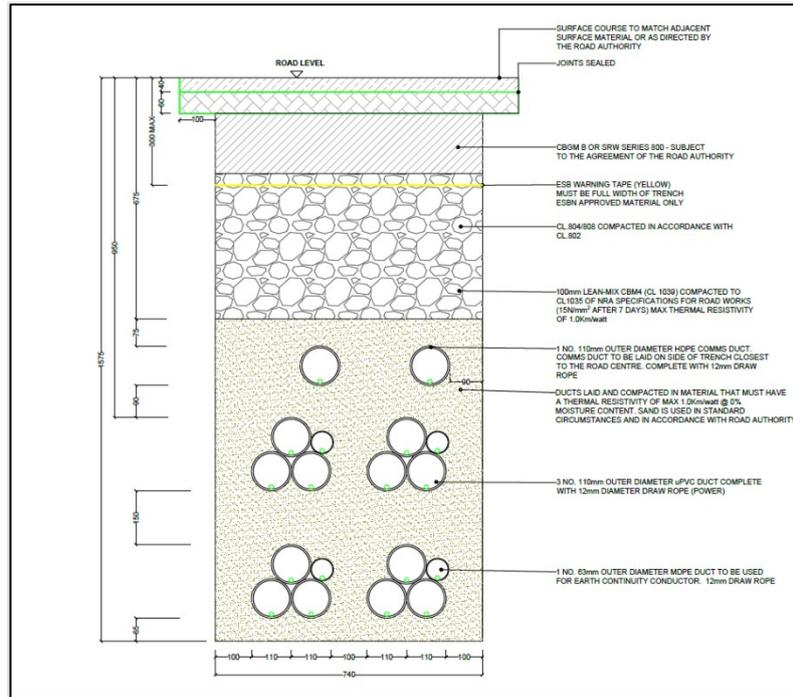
Stacked Four-Circuit Trench Detail in Public Road
